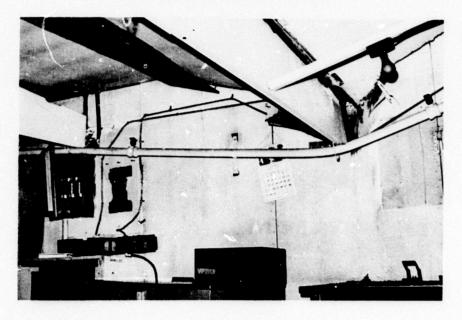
Sheared wall panel in headquarters building, Trench 20.
